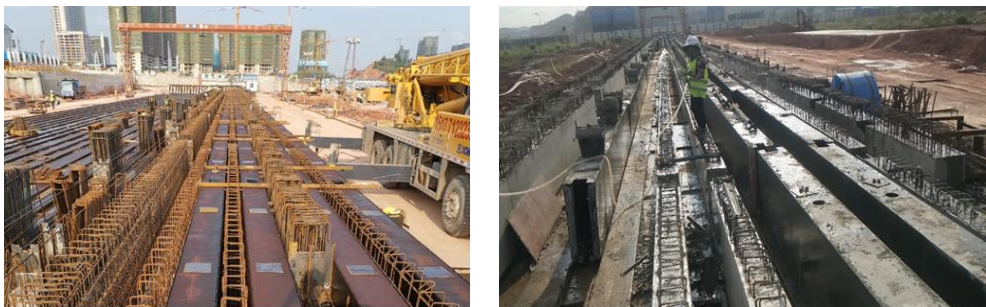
Construction drawing of a city smart park project's prestressed beam production site
